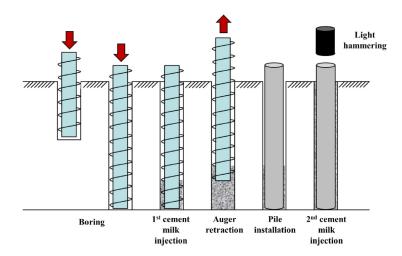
Drawing. Prebored and precast pile installation process (Kim et al. 2020).
